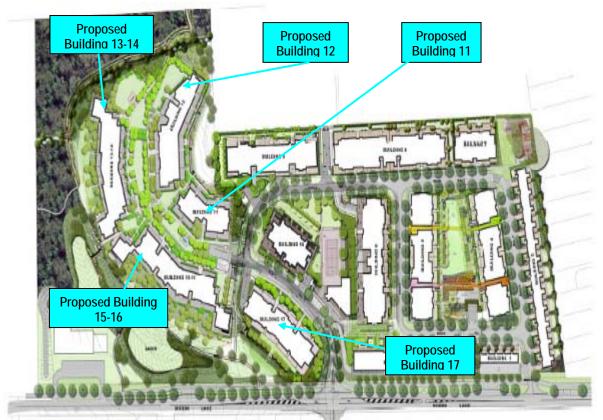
Location of Proposed Buildings in Stage 3 and Approved Buildings in Stages 1 and 2
